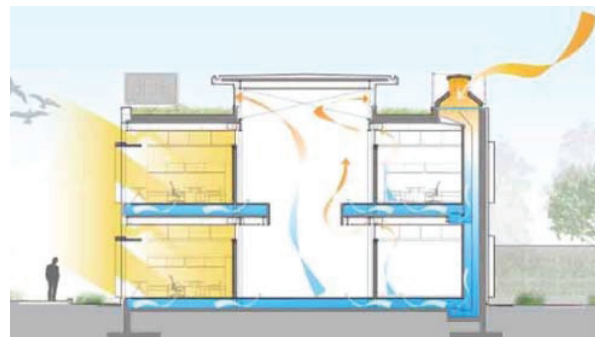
Building section showing the passive downdraft and daylighting components of the facility.
